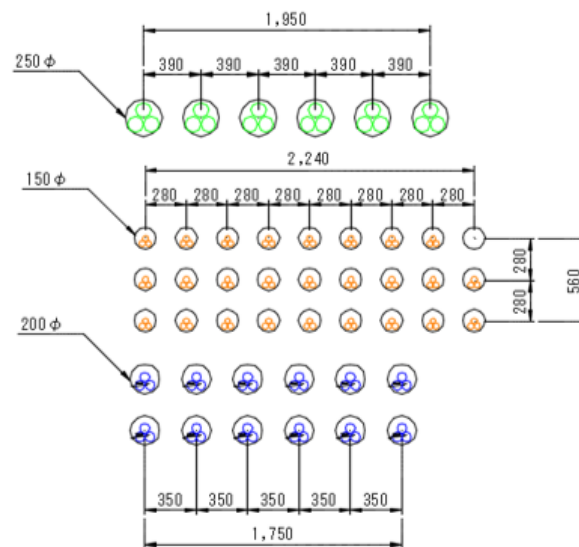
Location of Underground Tunnel for Kawranbazar UGSS
